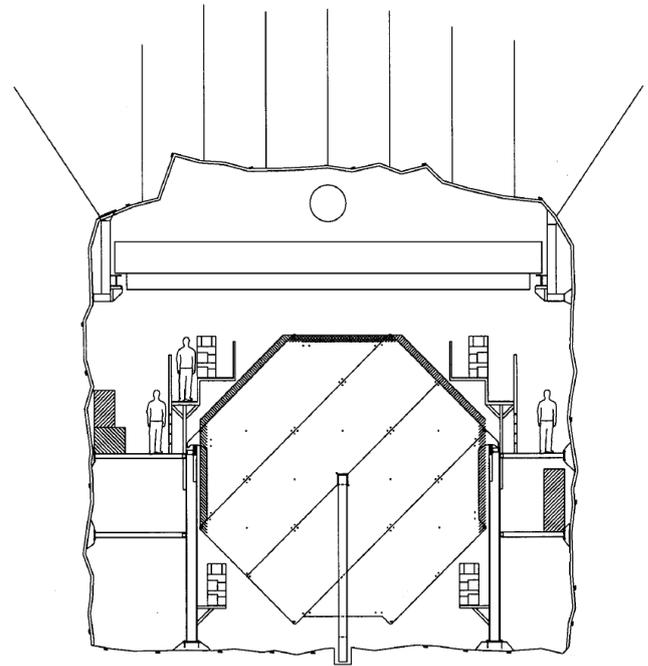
Front view of a hanging steel plane, showing the support structure and the vertical magnet coil.
